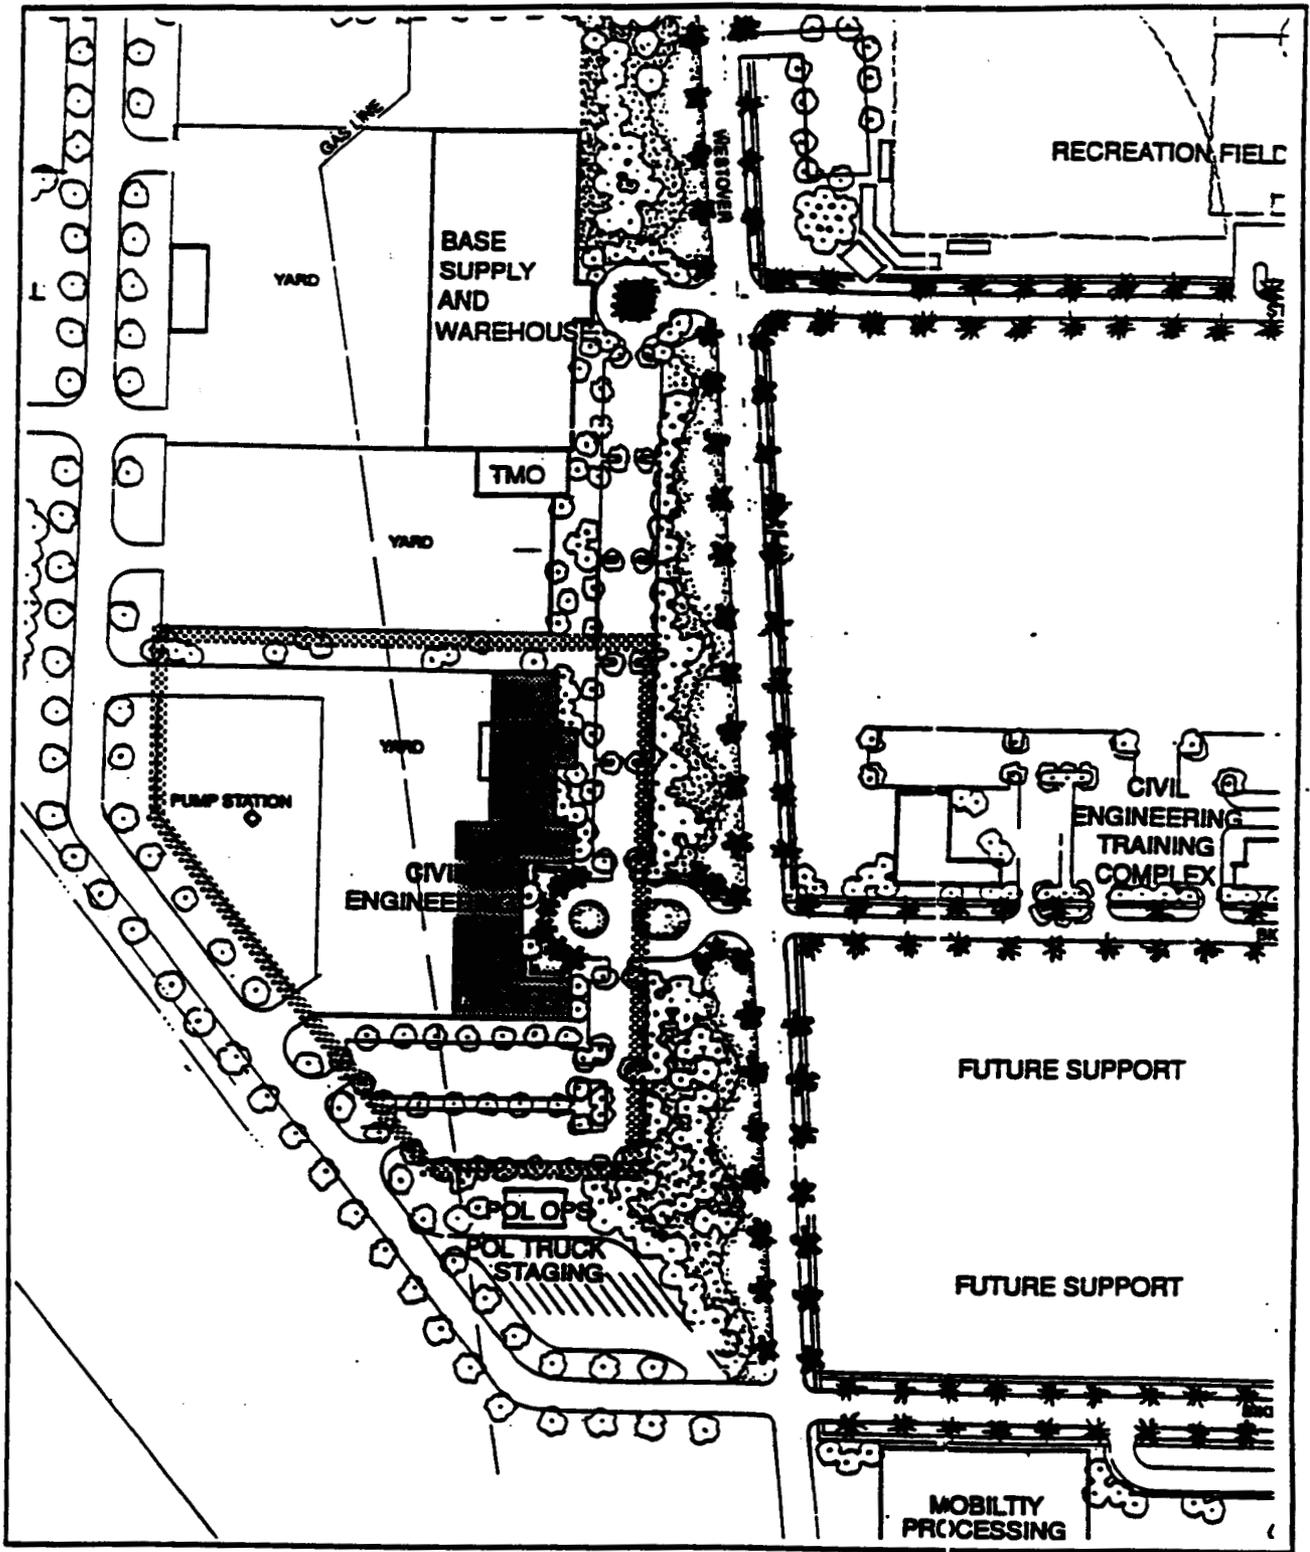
Area Development Plan for Civil Engineering Complex
